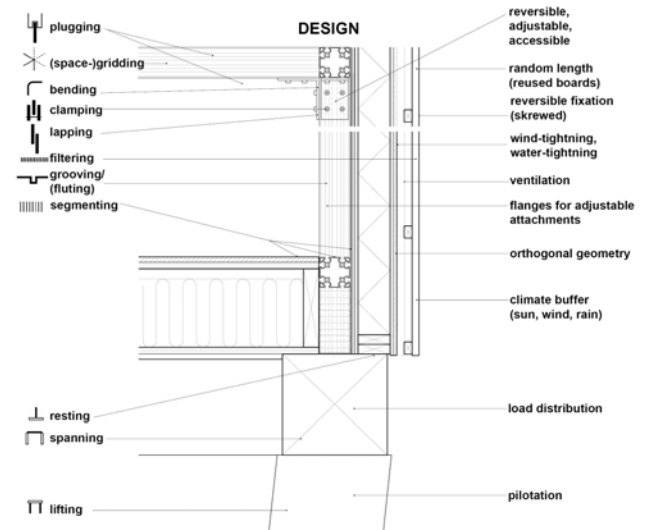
KieranTimberlake, Loblolly House, facade detail.
